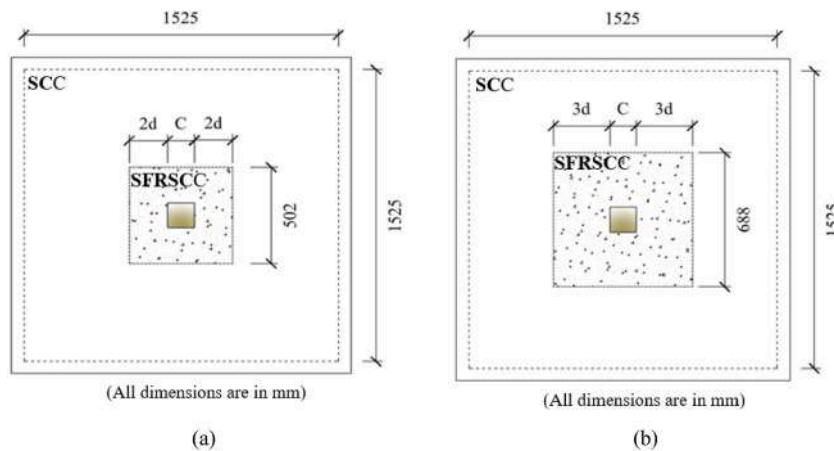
Plan layout for slabs (a) S4 and (b) S5.
